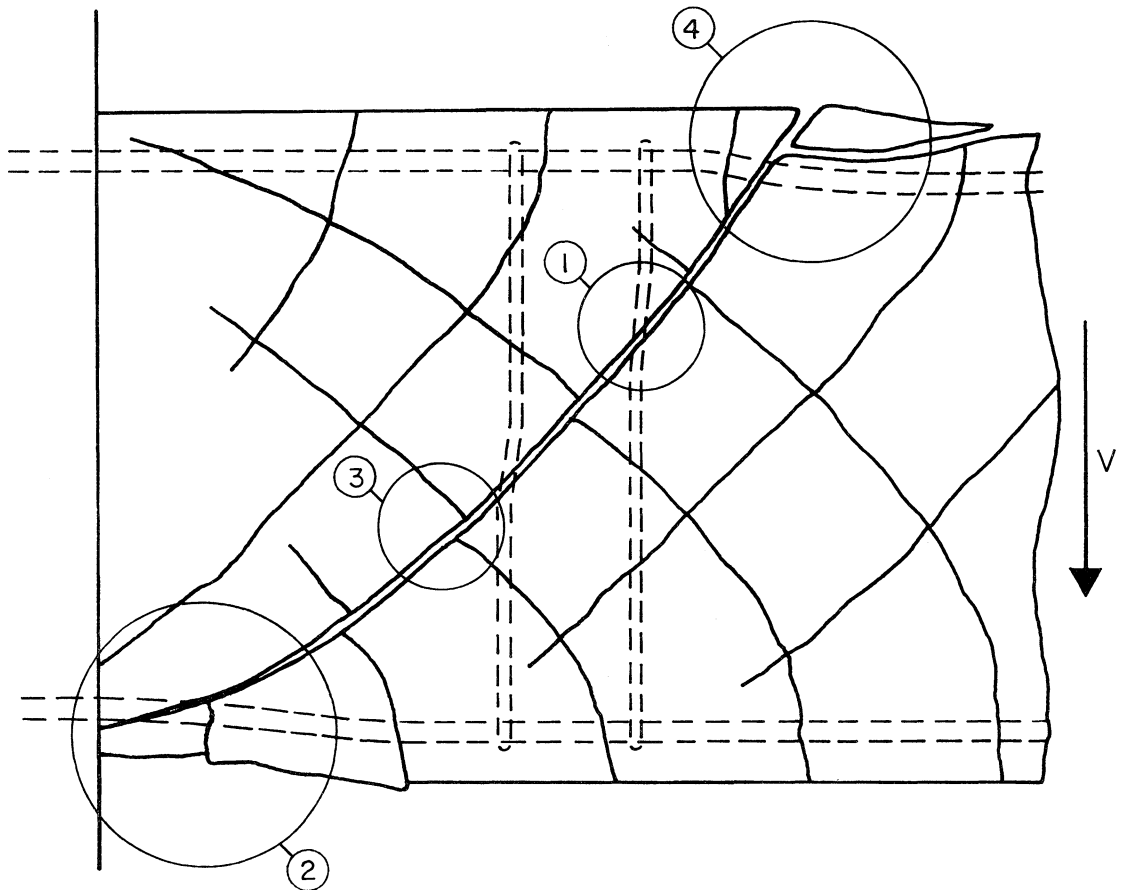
SPLITTING OF CONCRETE COVER -- BEAM 35
